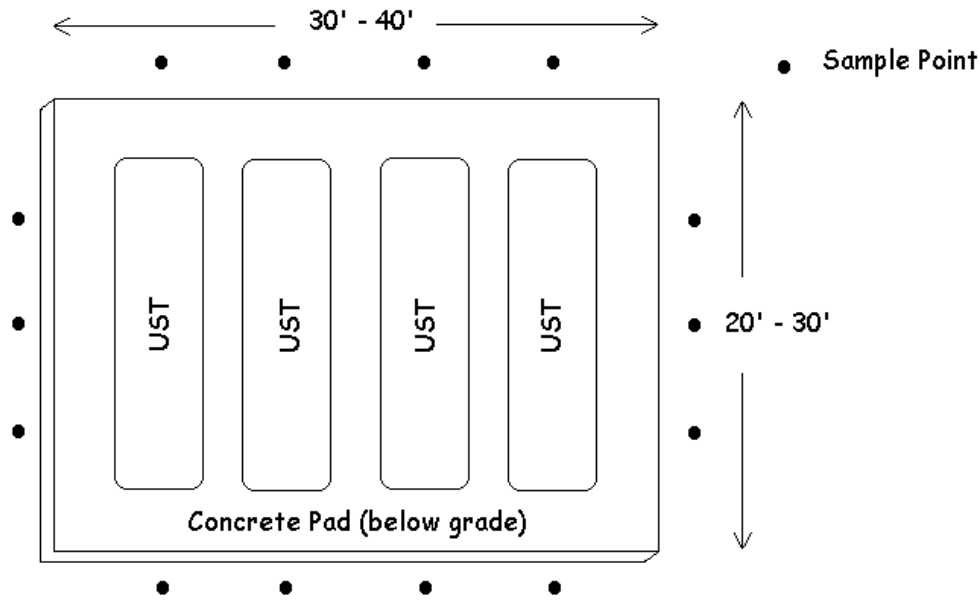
Typical sampling around concrete pads used for Underground Storage Tanks.
